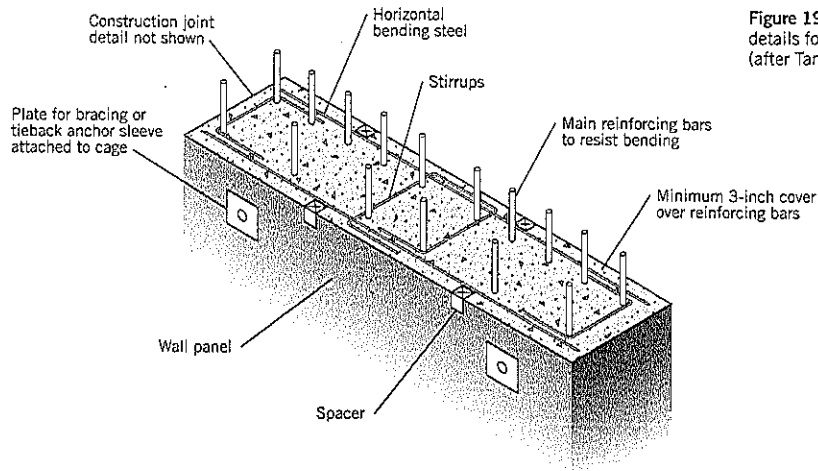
Typical reinforcement cage details for a slurry trench diaphragm wall (after Tamaro and Poletto, 1992).
